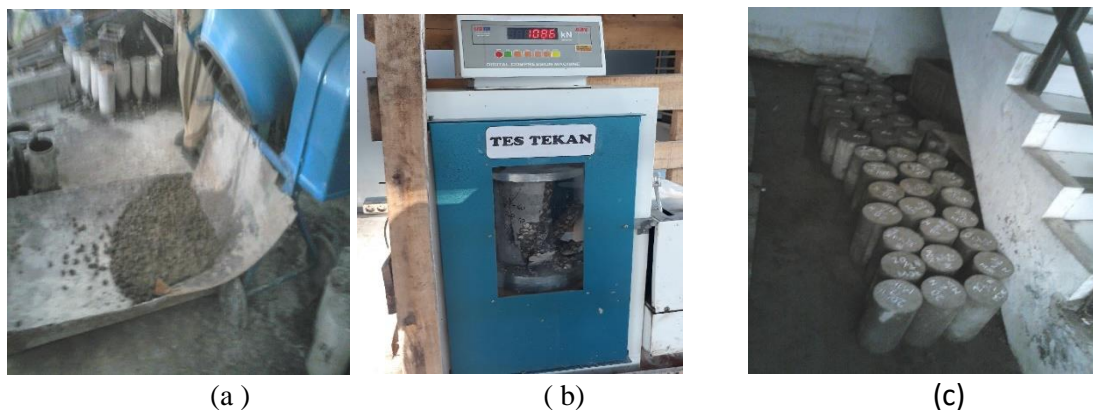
(a) Casting concrete (b) Compressive strength concrete (c) Test object concrete
